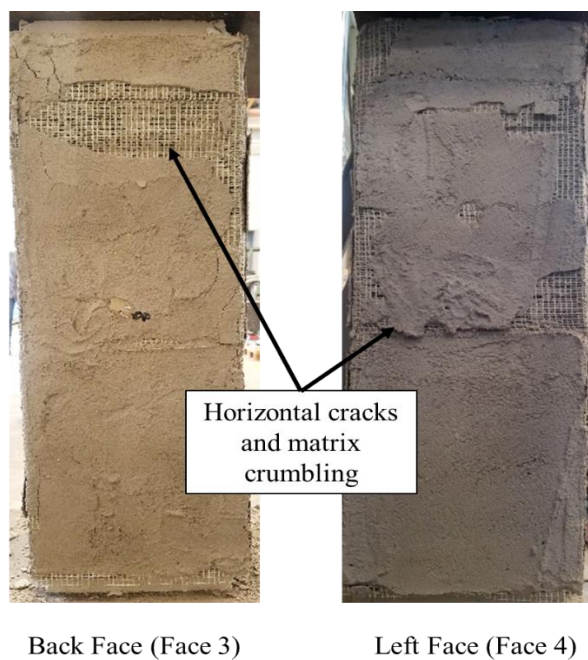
Specimen C-12-0-1-3 After Testing: Back and Left Faces
